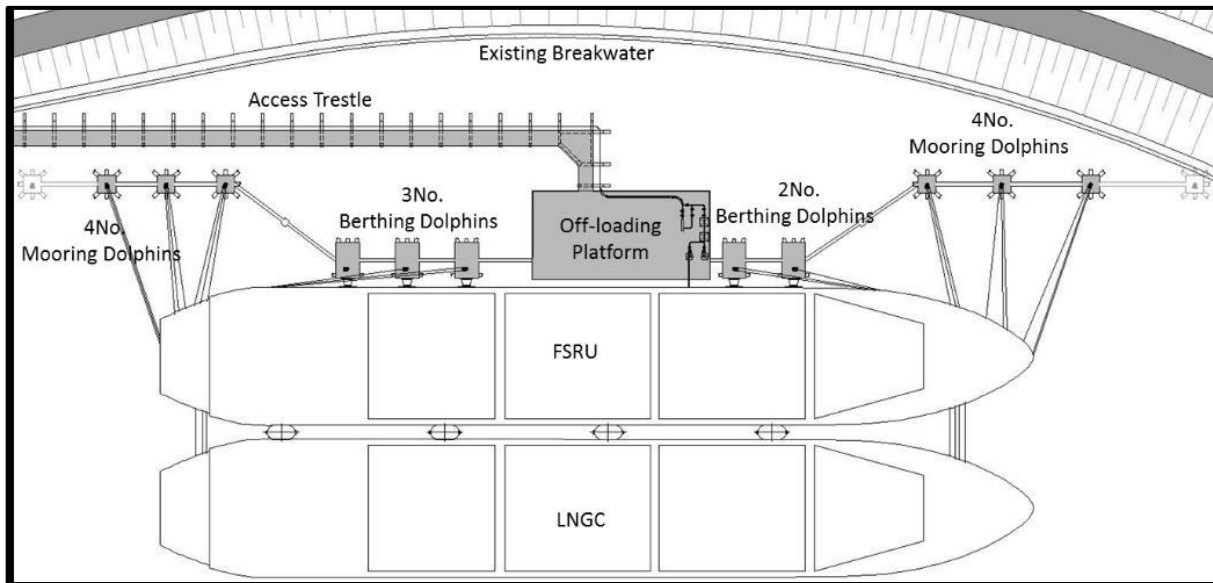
Layout plan of the proposed LNG terminal at the eastern breakwater in the Port of Ngqura.
